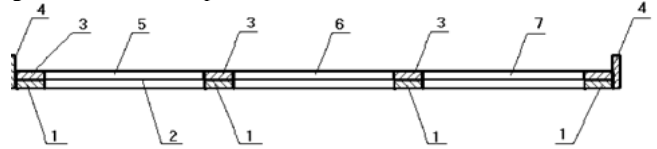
The scheme of concreting the beam of a hollow triangular section
